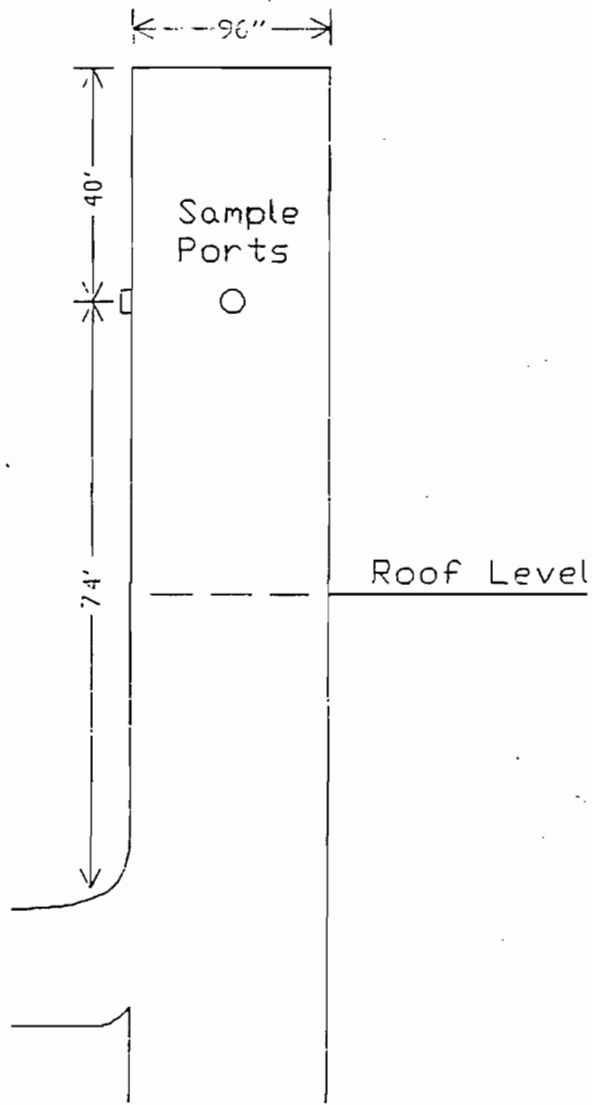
Stack Dimensions and sample port locations, Fort Pierce Utilities Authority, H.D. King Electric Generating Plant, Unit 8. Fort Pierce, Florida.
